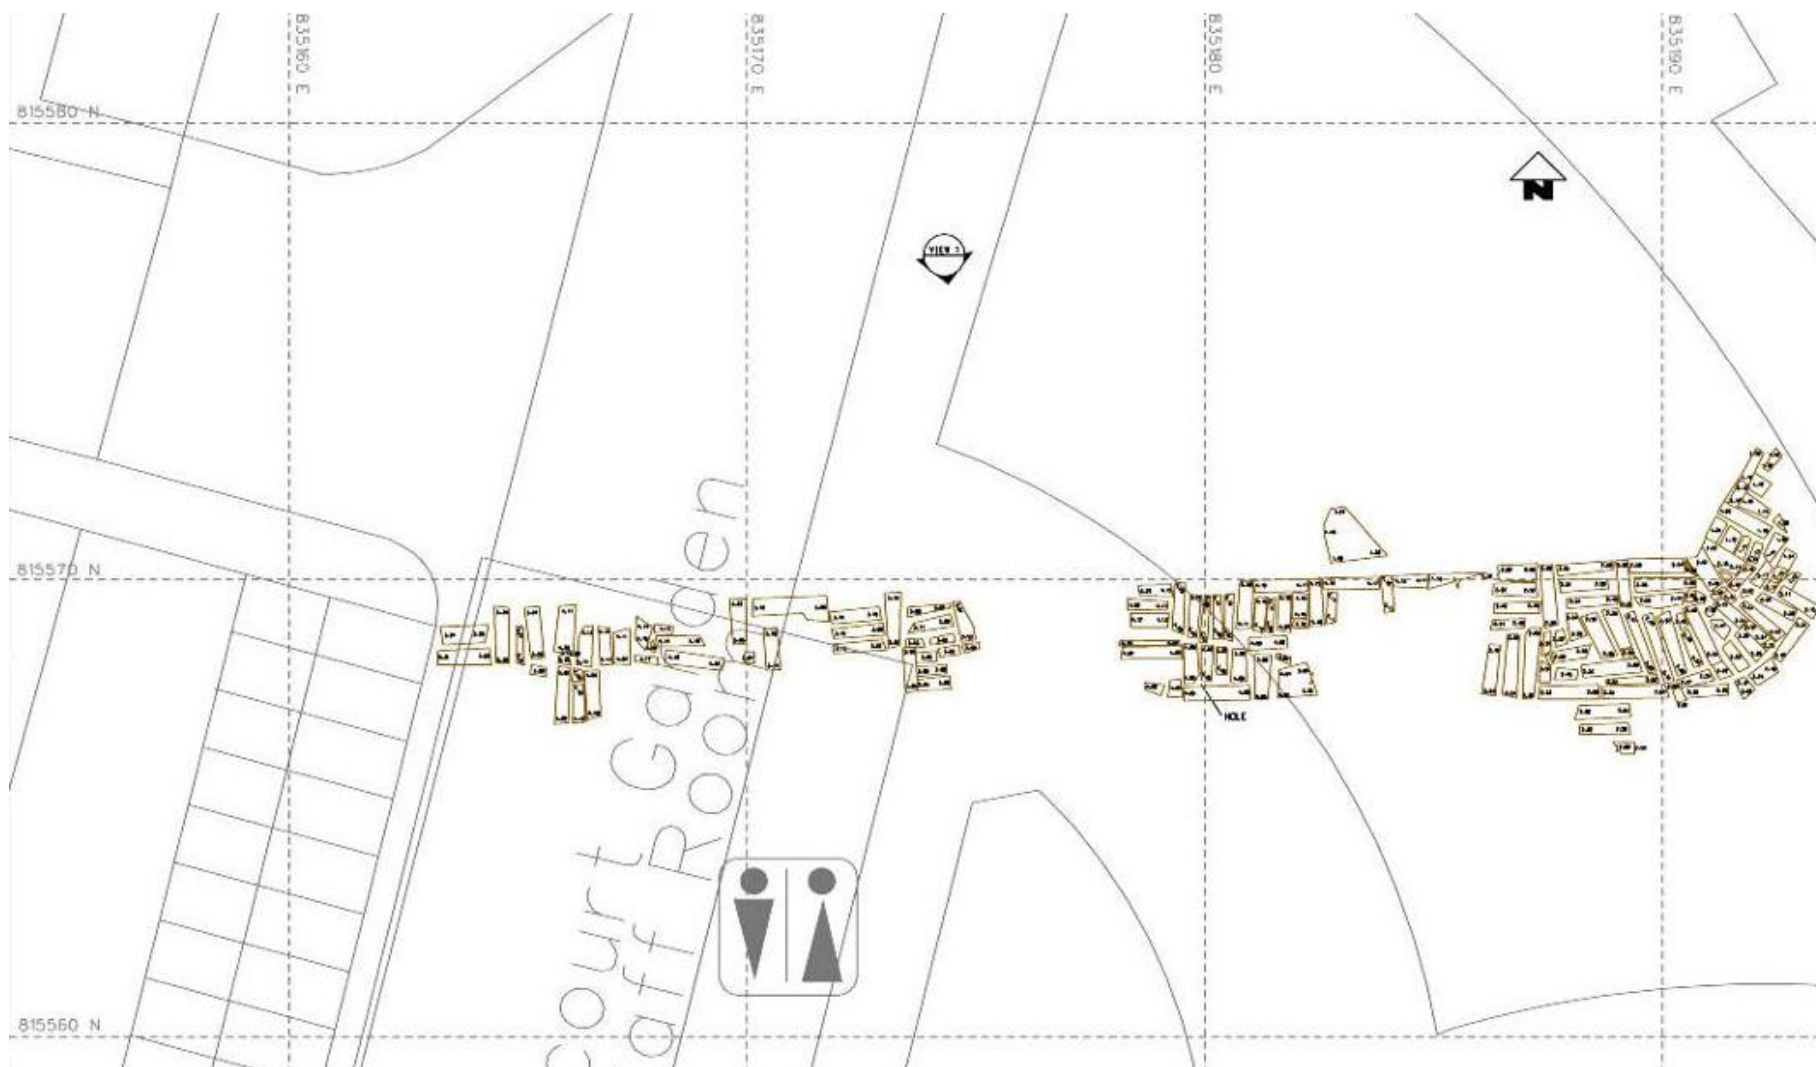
Surveyor drawing of the groundplan of the seawall showing the highest surviving levels901\_C\_ADM\_SUR\_C80\_005B
